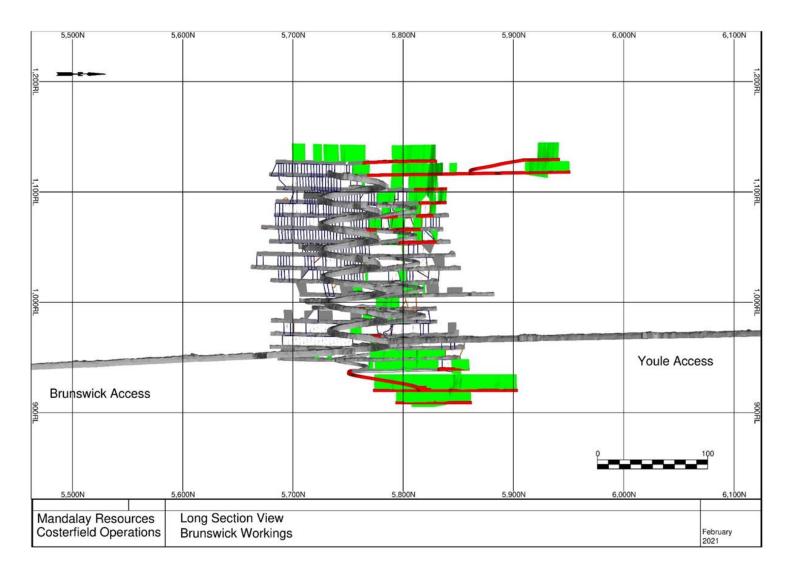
Long-section of Brunswick Mineral Reserve mine design (Red - planned operating development and green – planned stoping, grey – as built)
